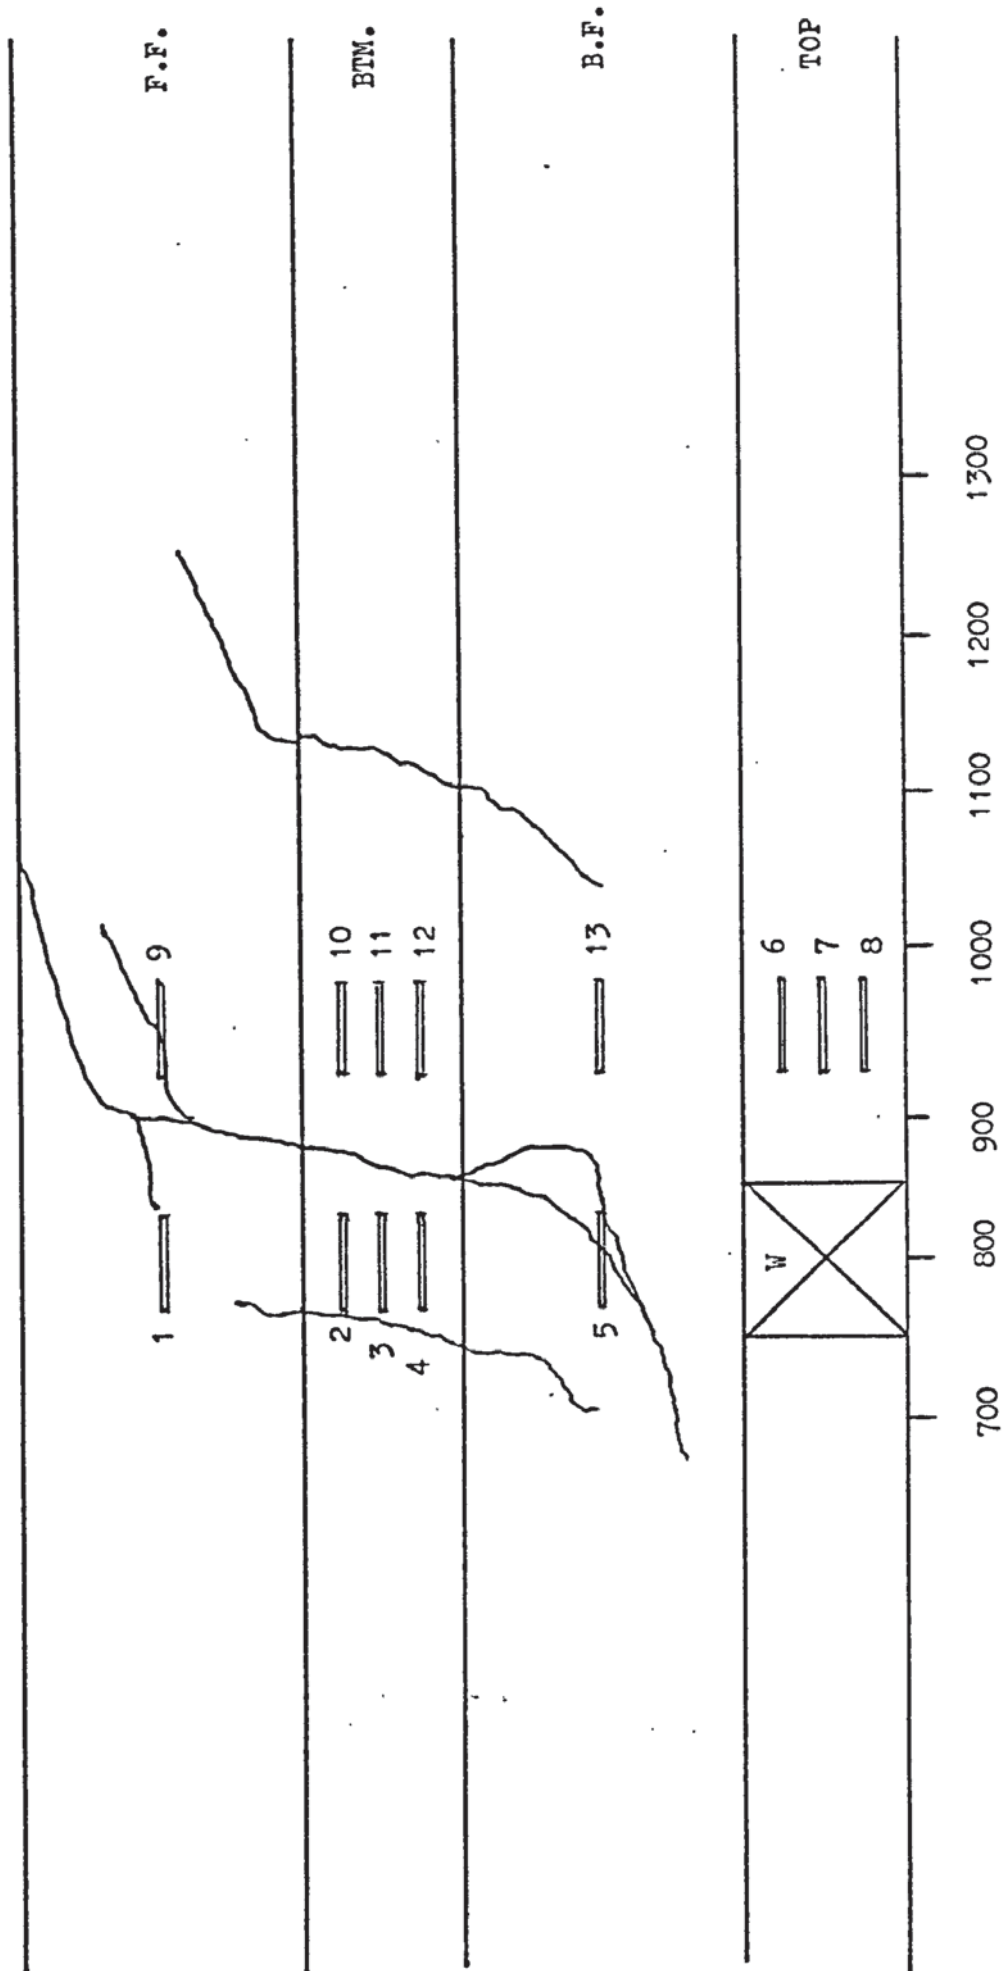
FAILURE CRACK PATTERNS - BEAM 22 (MODE 1)
